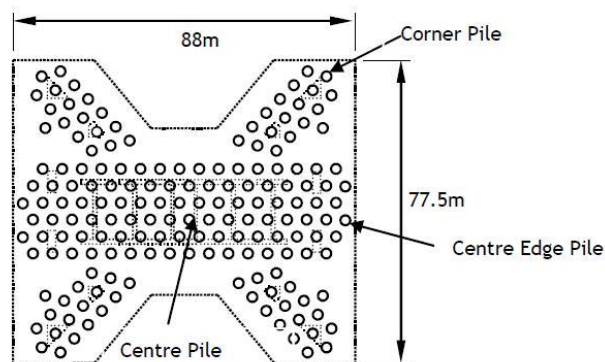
Pile Layout Plan Incheon Tower (Abdelrazaq et al., 2011)
